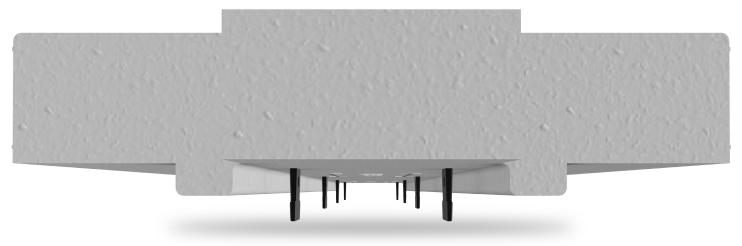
BuildBuck Buck showing end connection and "T" concrete anchors.
